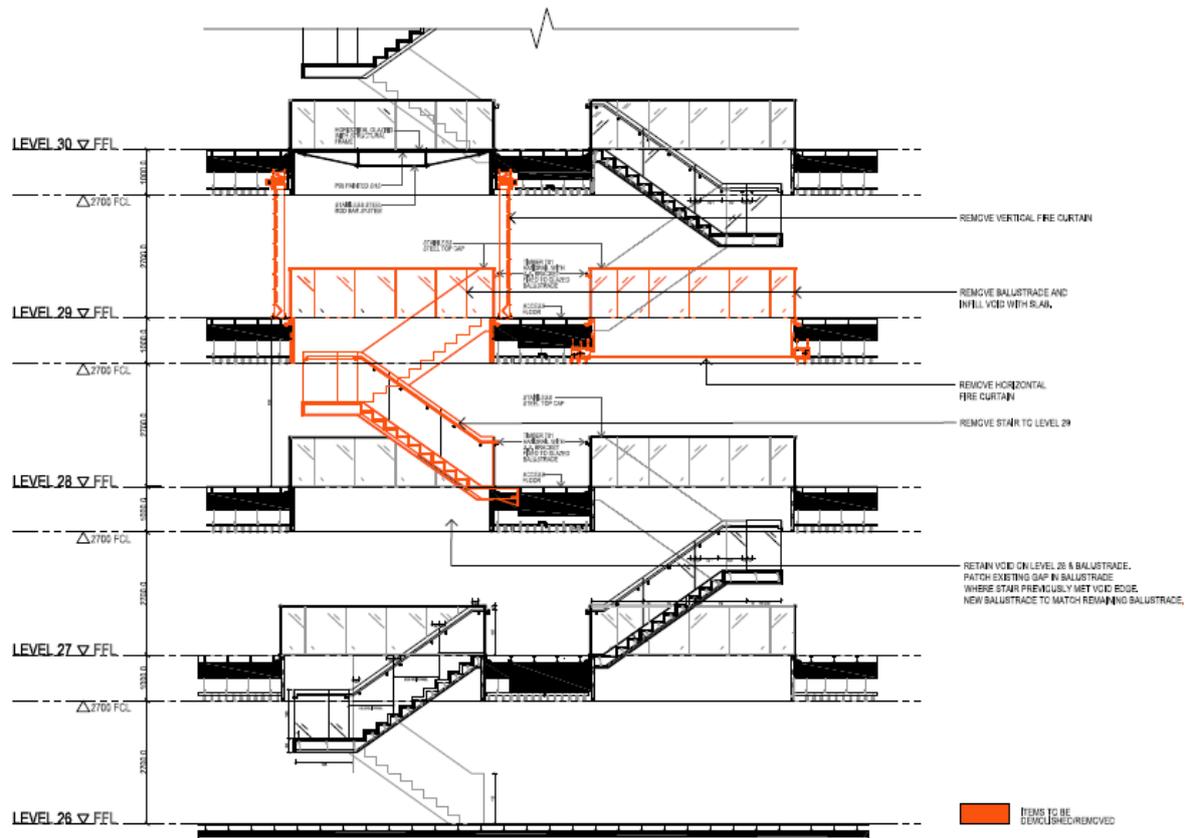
Section showing proposed demolition to Levels 28 and 29 in orange
